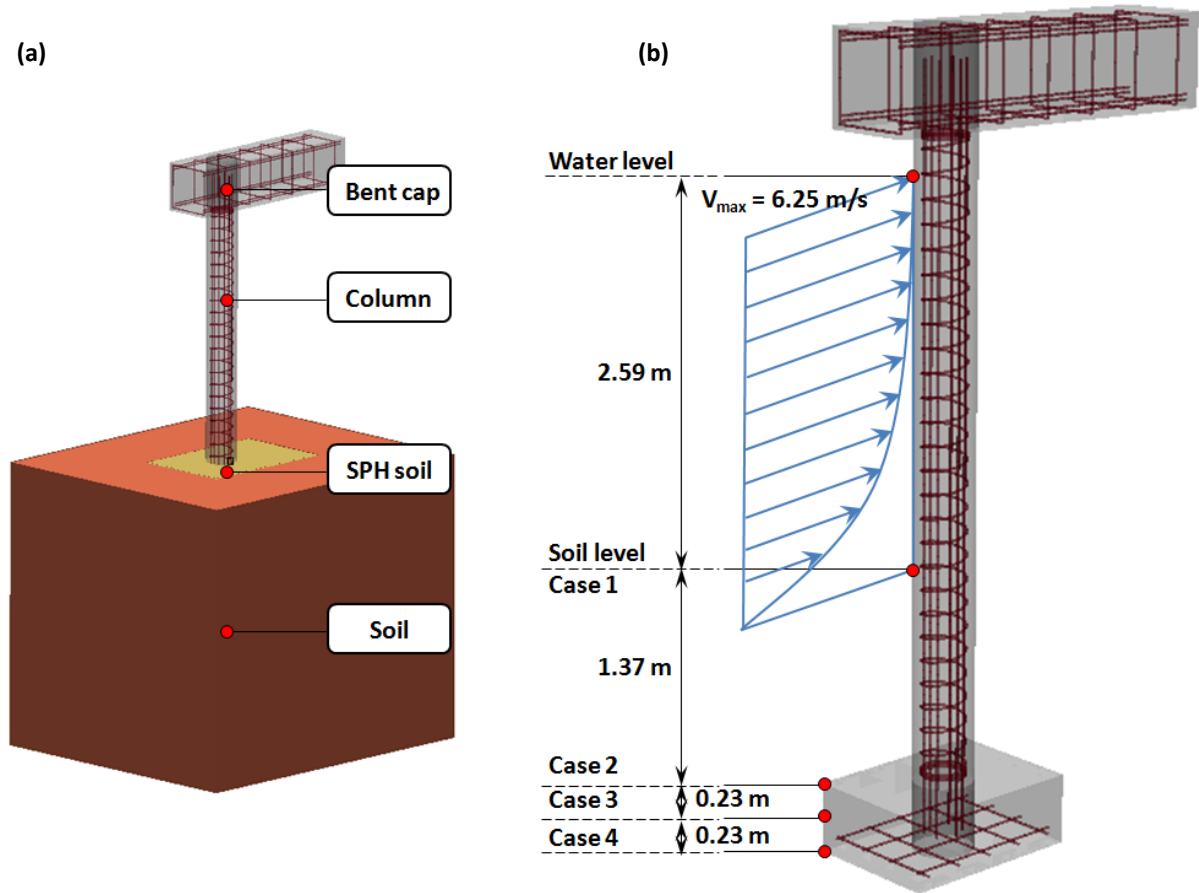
Computational model of the bent cap, column and soil of the Oat Ditch Bridge
